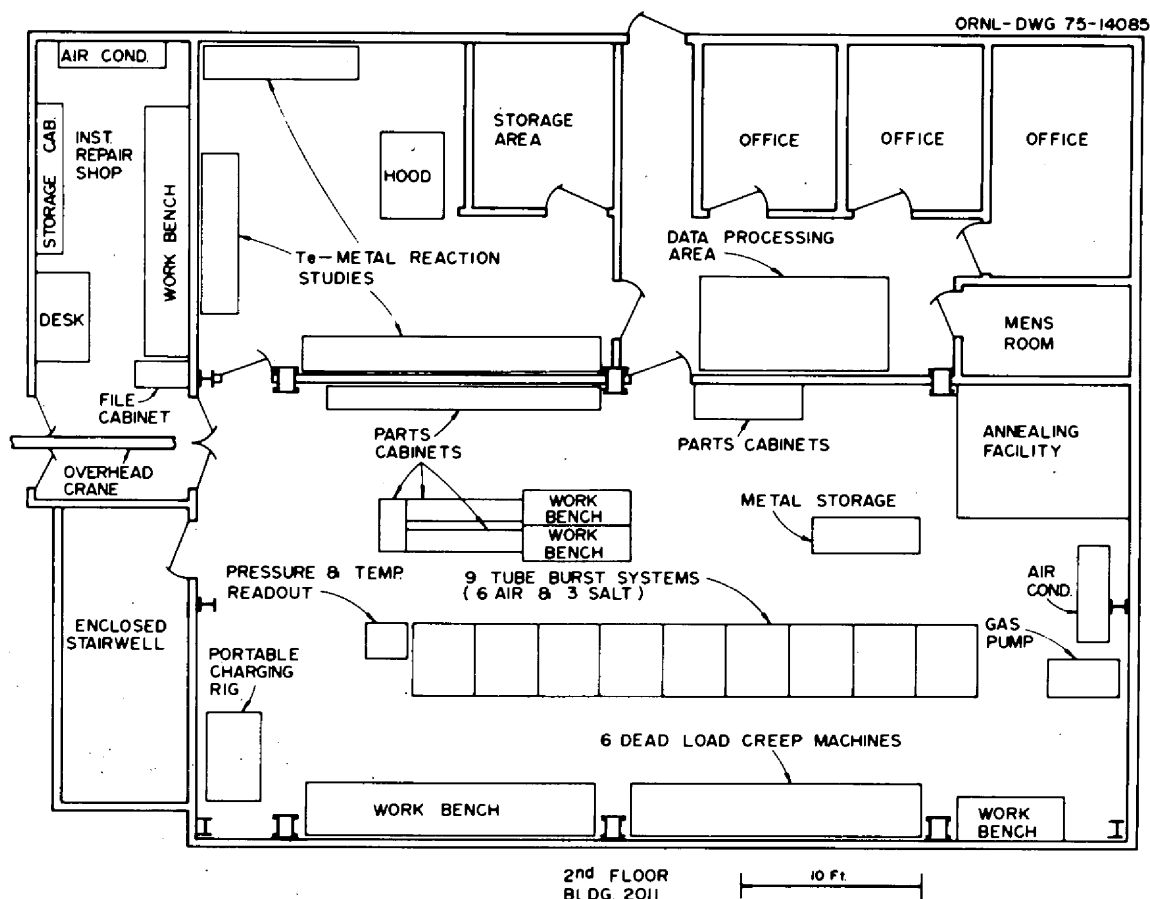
Equipment layout for the second floor of Building 2011.
